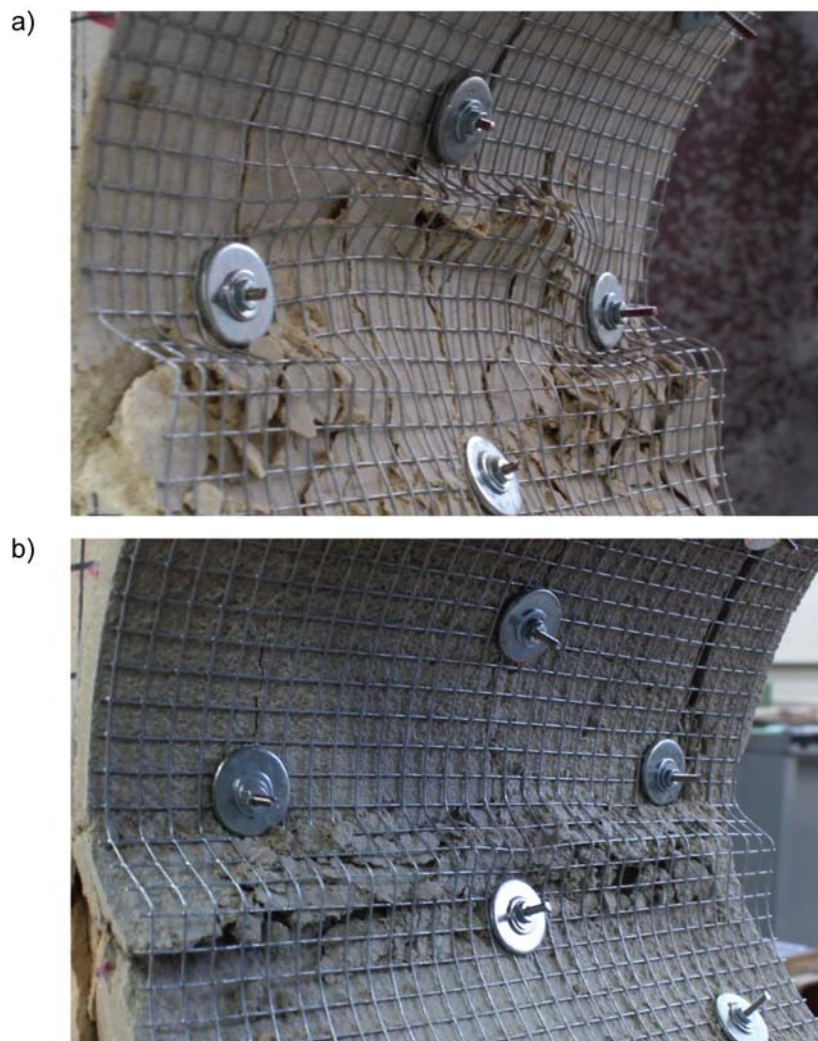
Tunnel sidewall after failure a) stiff welded mesh and rock bolts (Specimen No.1) b) 5 mm thick shotcrete layer, stiff welded mesh and rock bolts (Specimen No.2).
